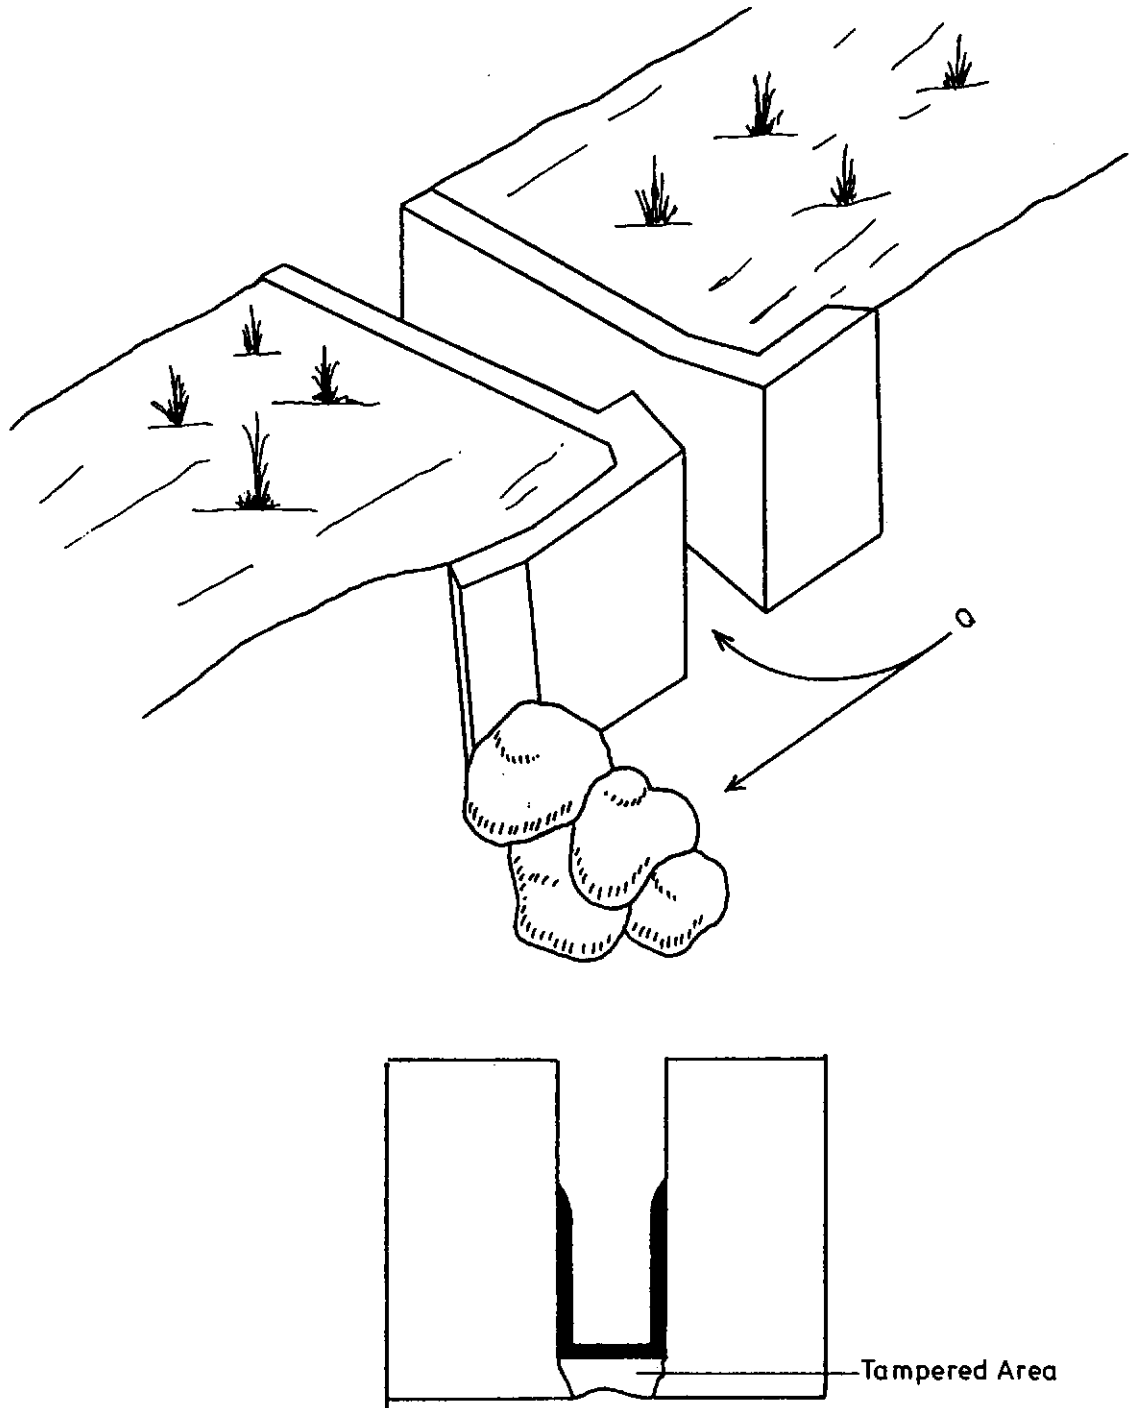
Plan and elevation of Outlet 239/2R (3R).
